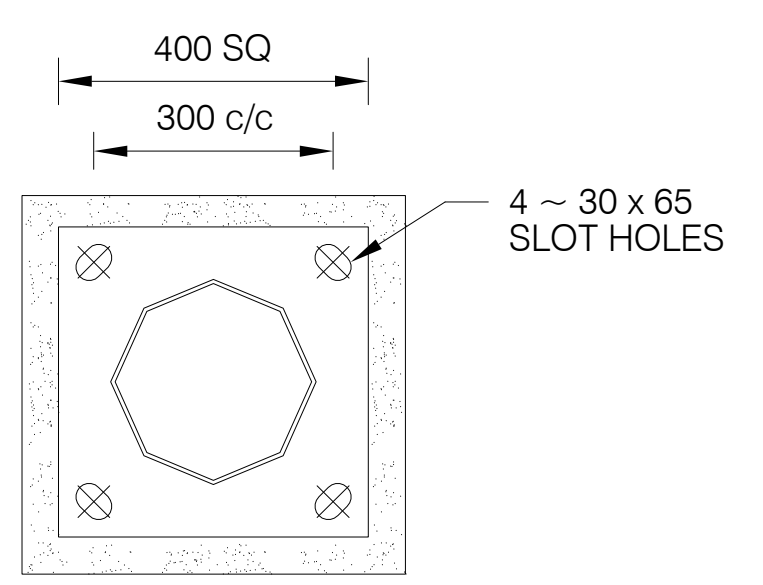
DOUBLE SLOT HINGED RIVED TO COLUMN
